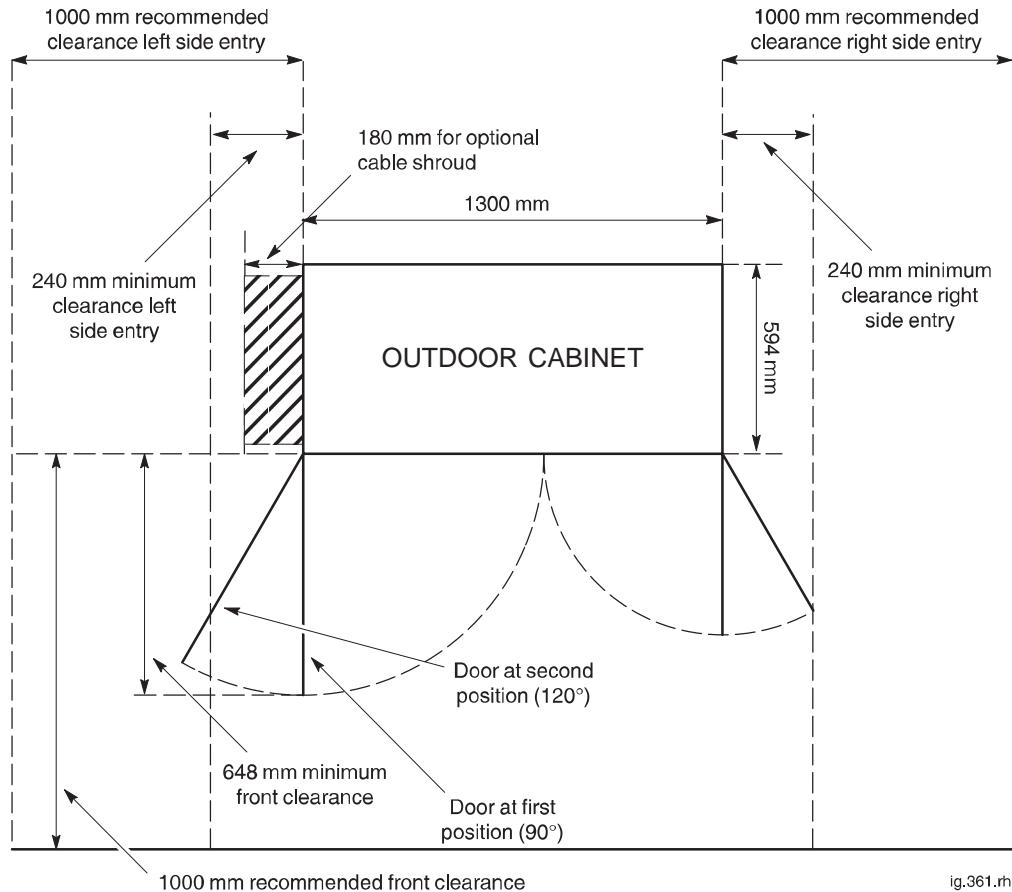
Outdoor cabinet site layout plan view (cable entry on left side)
